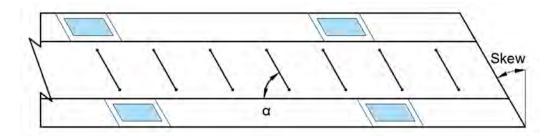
Plan View of 30 Degrees Skewed ITBC
